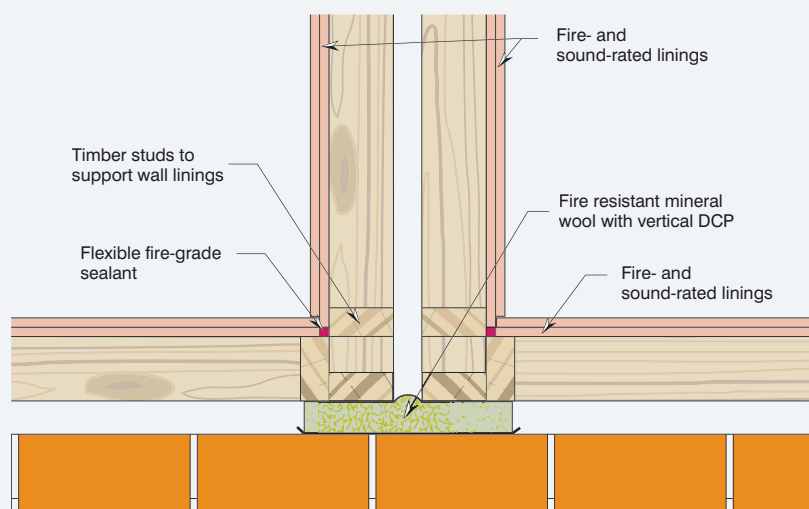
Cavity barrier (using mineral wool) at junction of fire-rated bounding wall and external wall – plan view.
